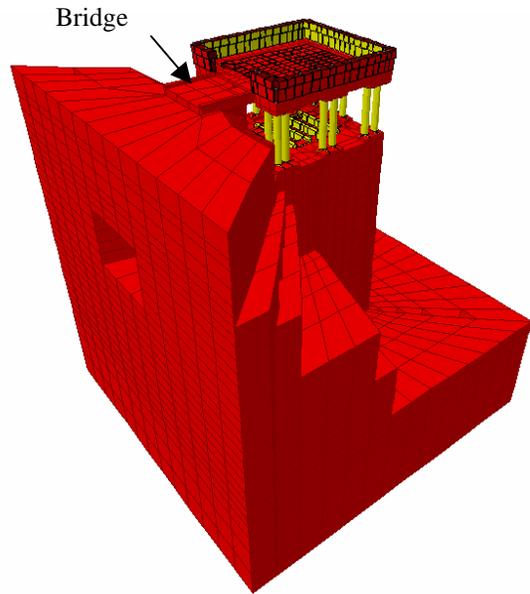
Back view of the tower, foundation, abutment, and pavilion model
